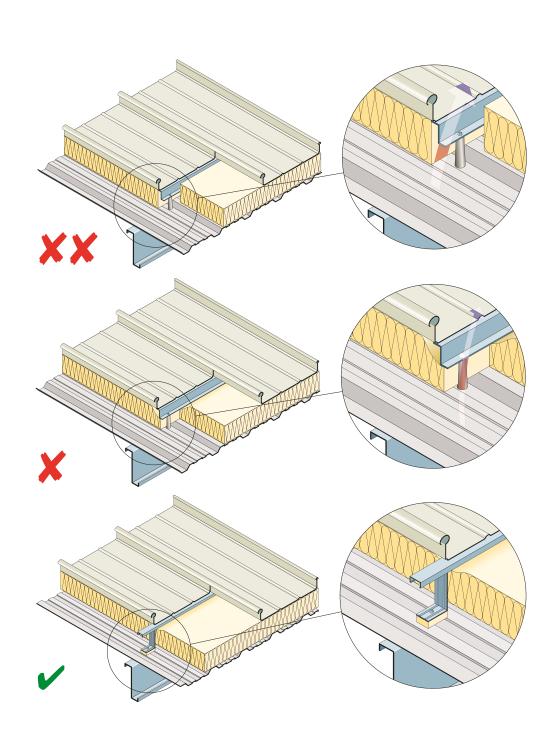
A rail and bracket spacer system incorporating a thermal break will avoid thermal bridging and maintain the thermal performance of the roof construction. Using a zed spacer bar system - which incorporates nylon ferrures - will create a substantial reduction in insulation thickness along the length of each zed spacer and therefore a consequent loss of thermal performance in the roof construction. If the insulation is cut and Figure 10 stopped at the zed bar with a gap left underneath, an even greater heat loss will occur.
